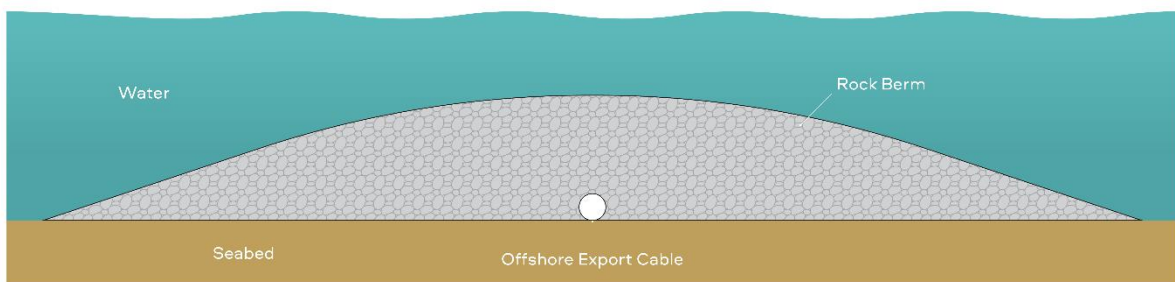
Cable Protection - Rock Berm after Storm Event and Seabed Lowering
